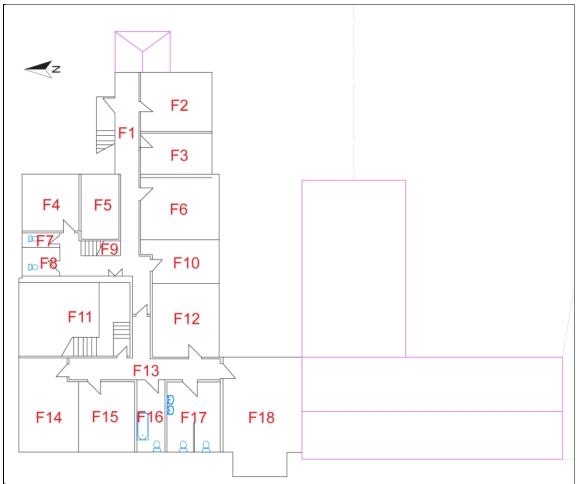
Plan of the first floor plan with room numbers (not to scale).
